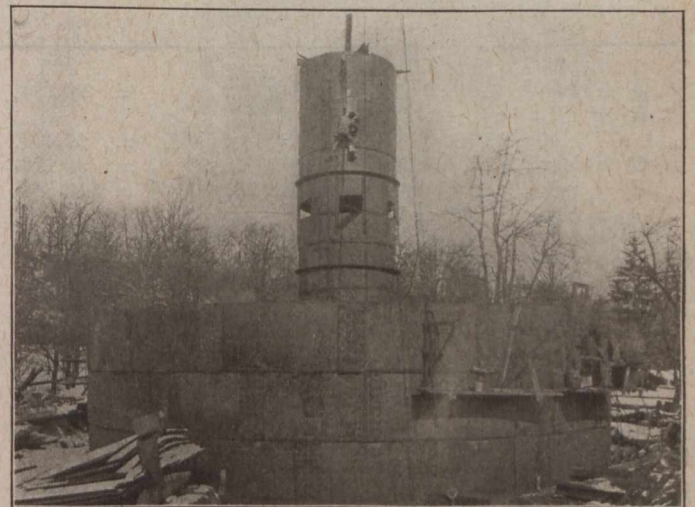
ONTARIO POWER CO.'S TANK, 60-FT. DIAMETER, WITH QUADRUPLE-RIVETED BUTT JOINTS ON LONGITUDINAL SEAMS AND SINGLE-RIVETED LAP ON GIRTH SEAMS
